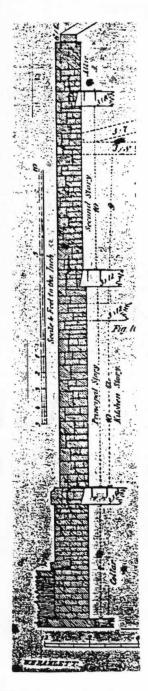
Brick wall construction from an 1849 pattern book. Source: William H. Ranlett. <u>The Architect: A Series of Original Designs.</u> (New York: Davenport, 1849).
